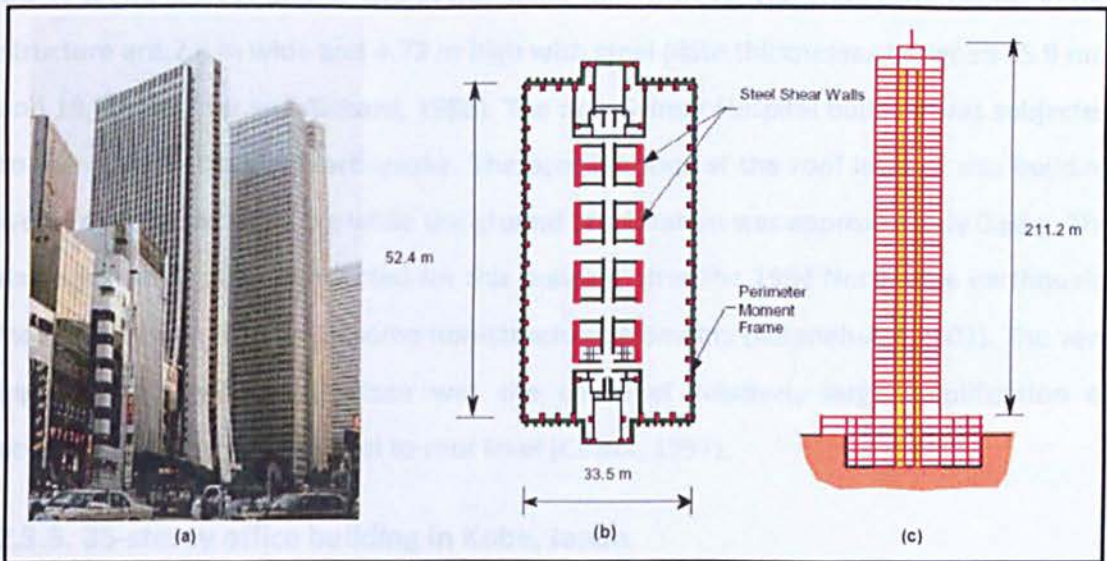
(a) Elevation view (b) Plan (c) Transverse section of 53-storey Shinjuku Nomura Building in Tokyo (Photo courtesy of P. Becker)
